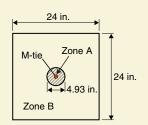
This diagram shows a 24 in. \times 24 in. portion of a precast concrete sandwich panel containing one M-tie. Note: 1 in. = 25.4 mm.
